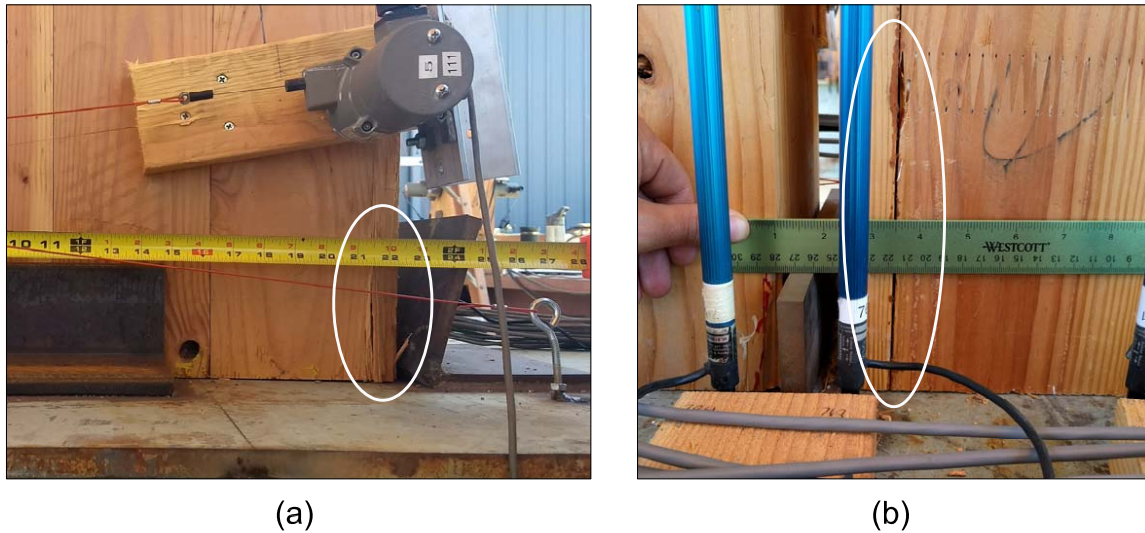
Photo of rocking wall corner after SLE level ground motions with (a) minor cracking and (b) laminate spreading
